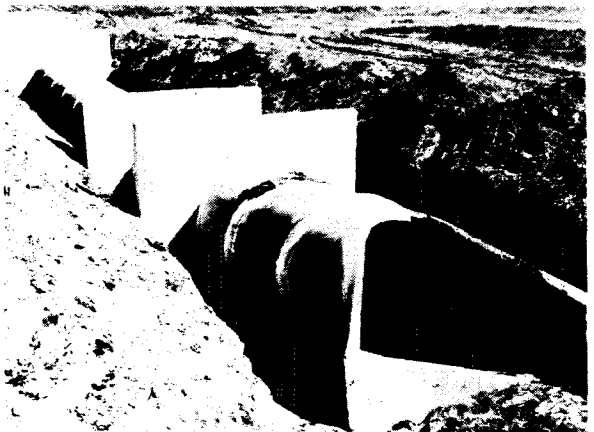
Precast concrete pipe culvert with precast concrete inlet transition. P-328-701-6507
